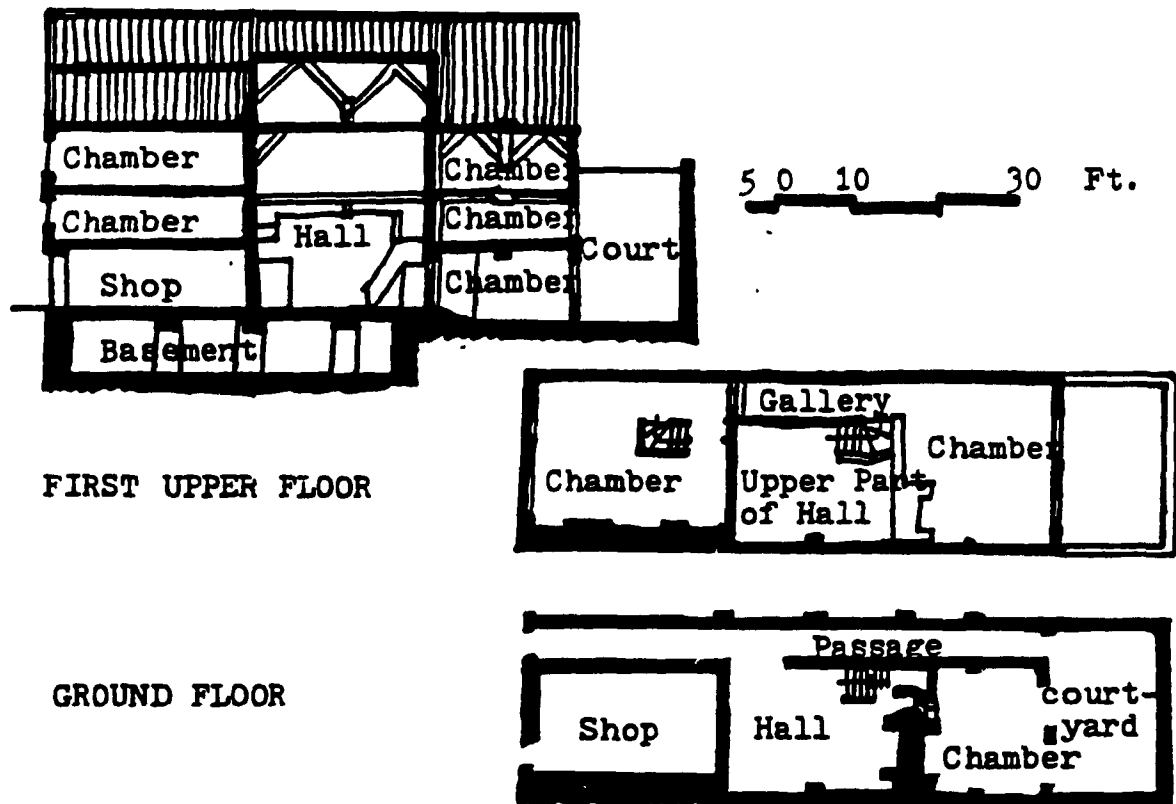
Plans and Section of a typical narrow Medieval House in Salisbury, England.
